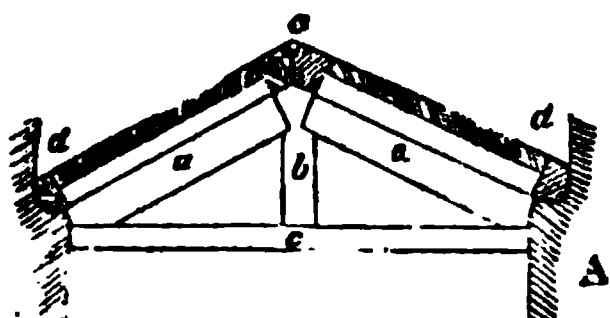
Represents a plan of a wooden mitre-sill, and a horizontal section of a lock-gate (Fig. 246) closed.
